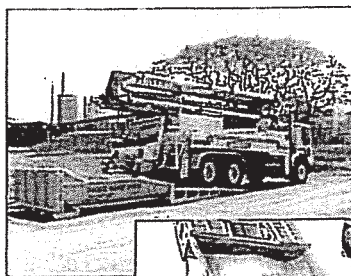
Pump truck using the ramp to wash out into a roll-off bin
